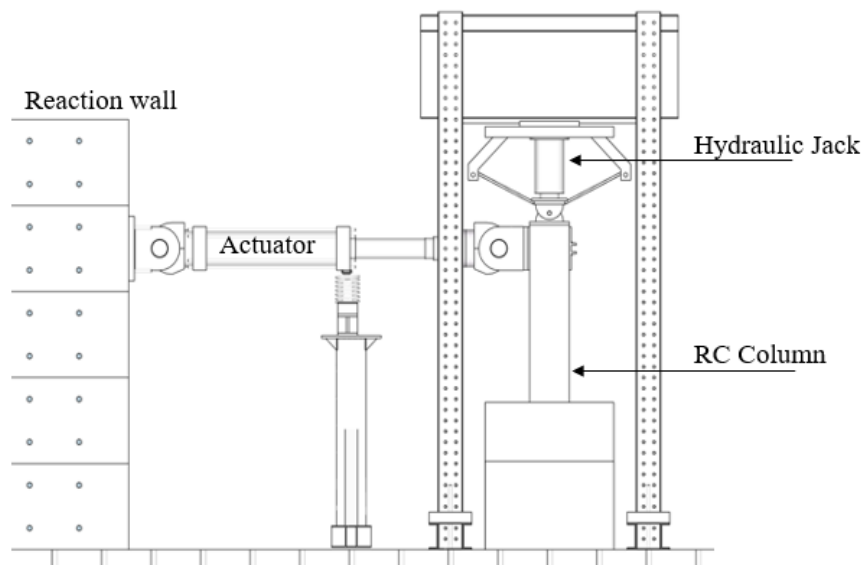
Specimen connected to the actuator and hydraulic jack.
